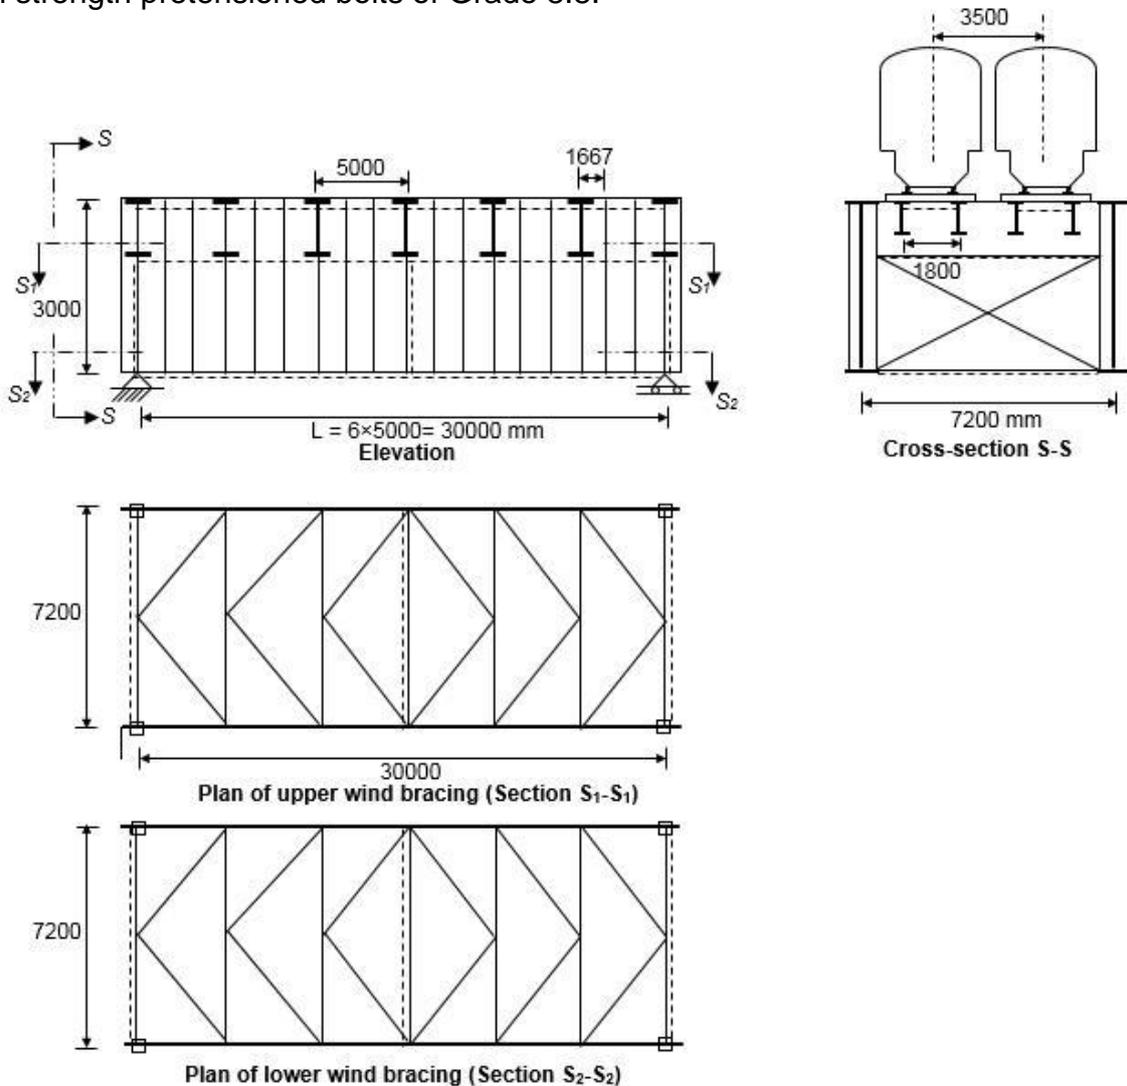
(a) General layout of a double track open-timber floor plate girder deck railway steel bridge detailed by the author in (Ellobody 2014)
